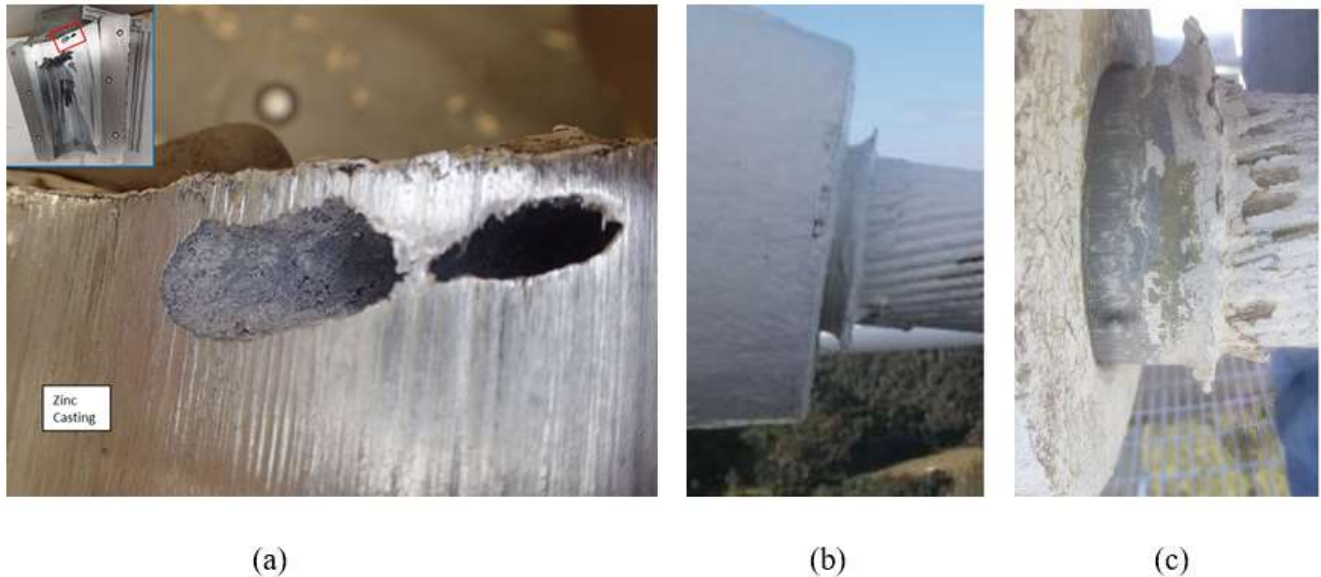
(a) Close-up view of a single gas bubble in zinc casting; (b) 2003 photo of aux M4N showing ~0.5-inch zinc seating extrusion; (c) 2019 photo showing ~1 3/8-inches extrusion. (WJE, 2021)
